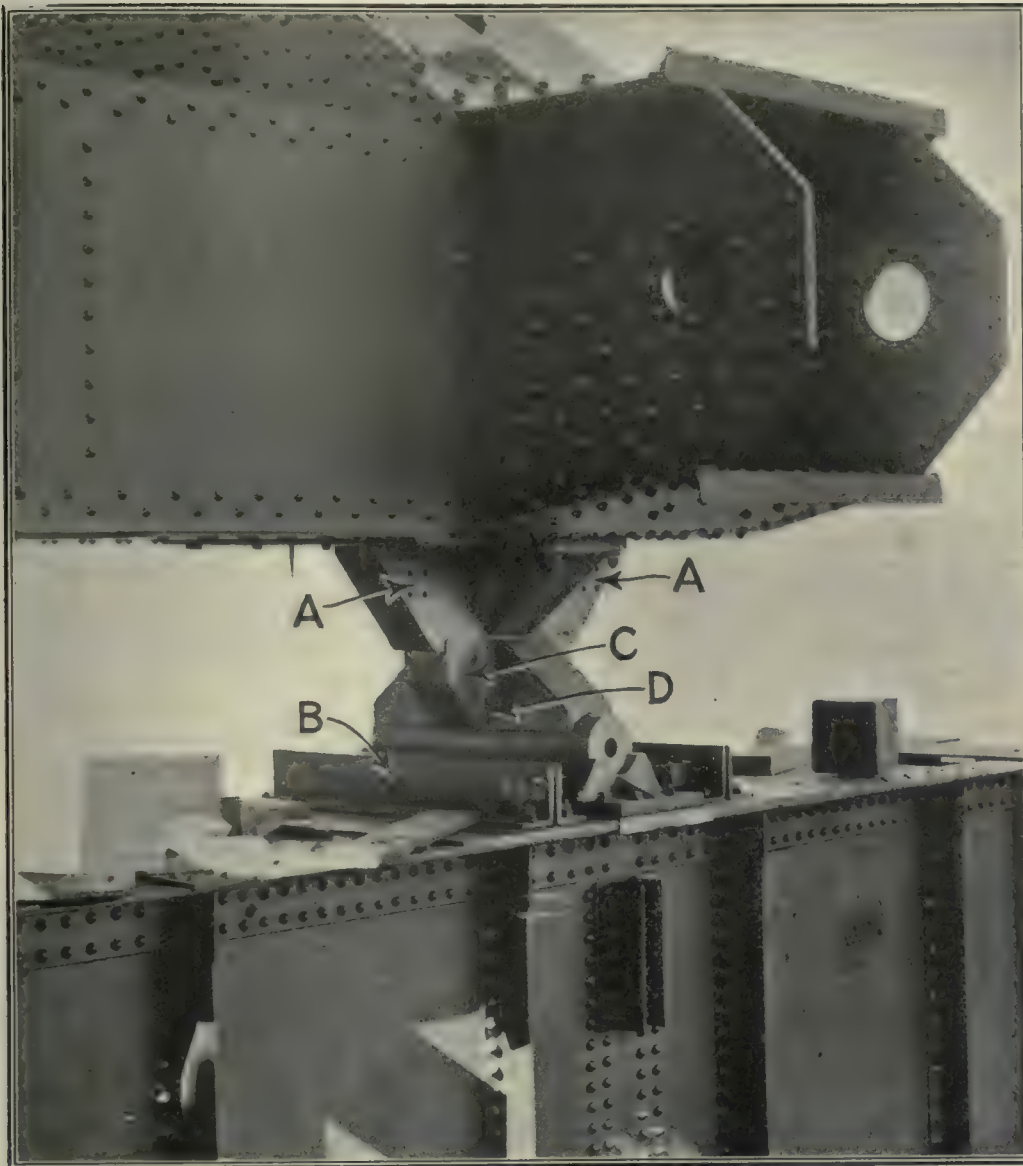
ABOVE—ROCKER-JOINT BEARING CARRIED SPAN LOAD TO LIFTING GIRDER
